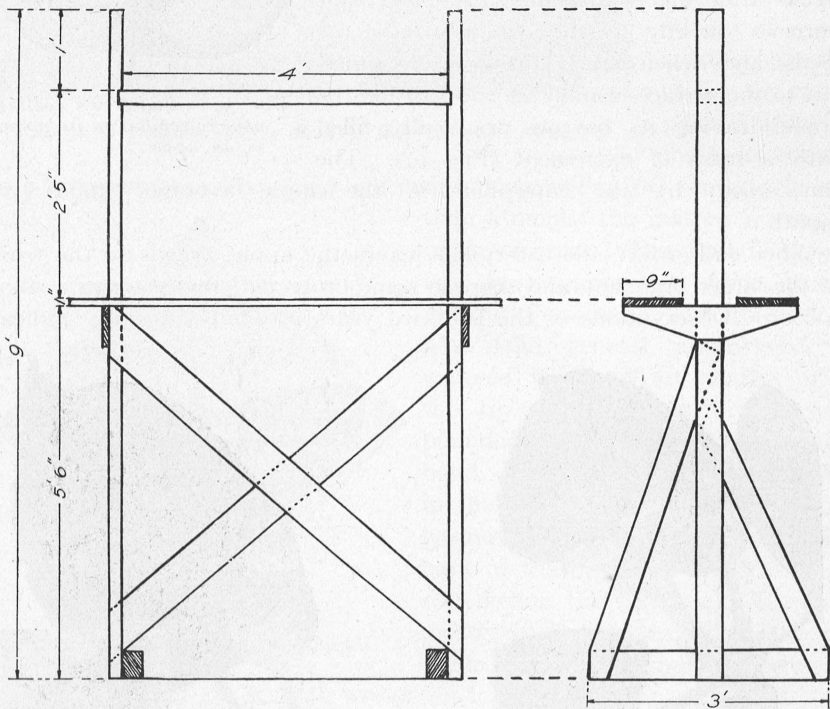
Working drawing of a cheap but serviceable spraying tower
